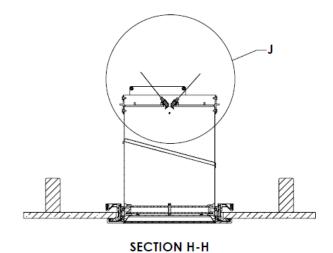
TYPICAL SOLATUBE LIGHT KIT ASSEMBLY FOR 160 DS AND 290 DS
